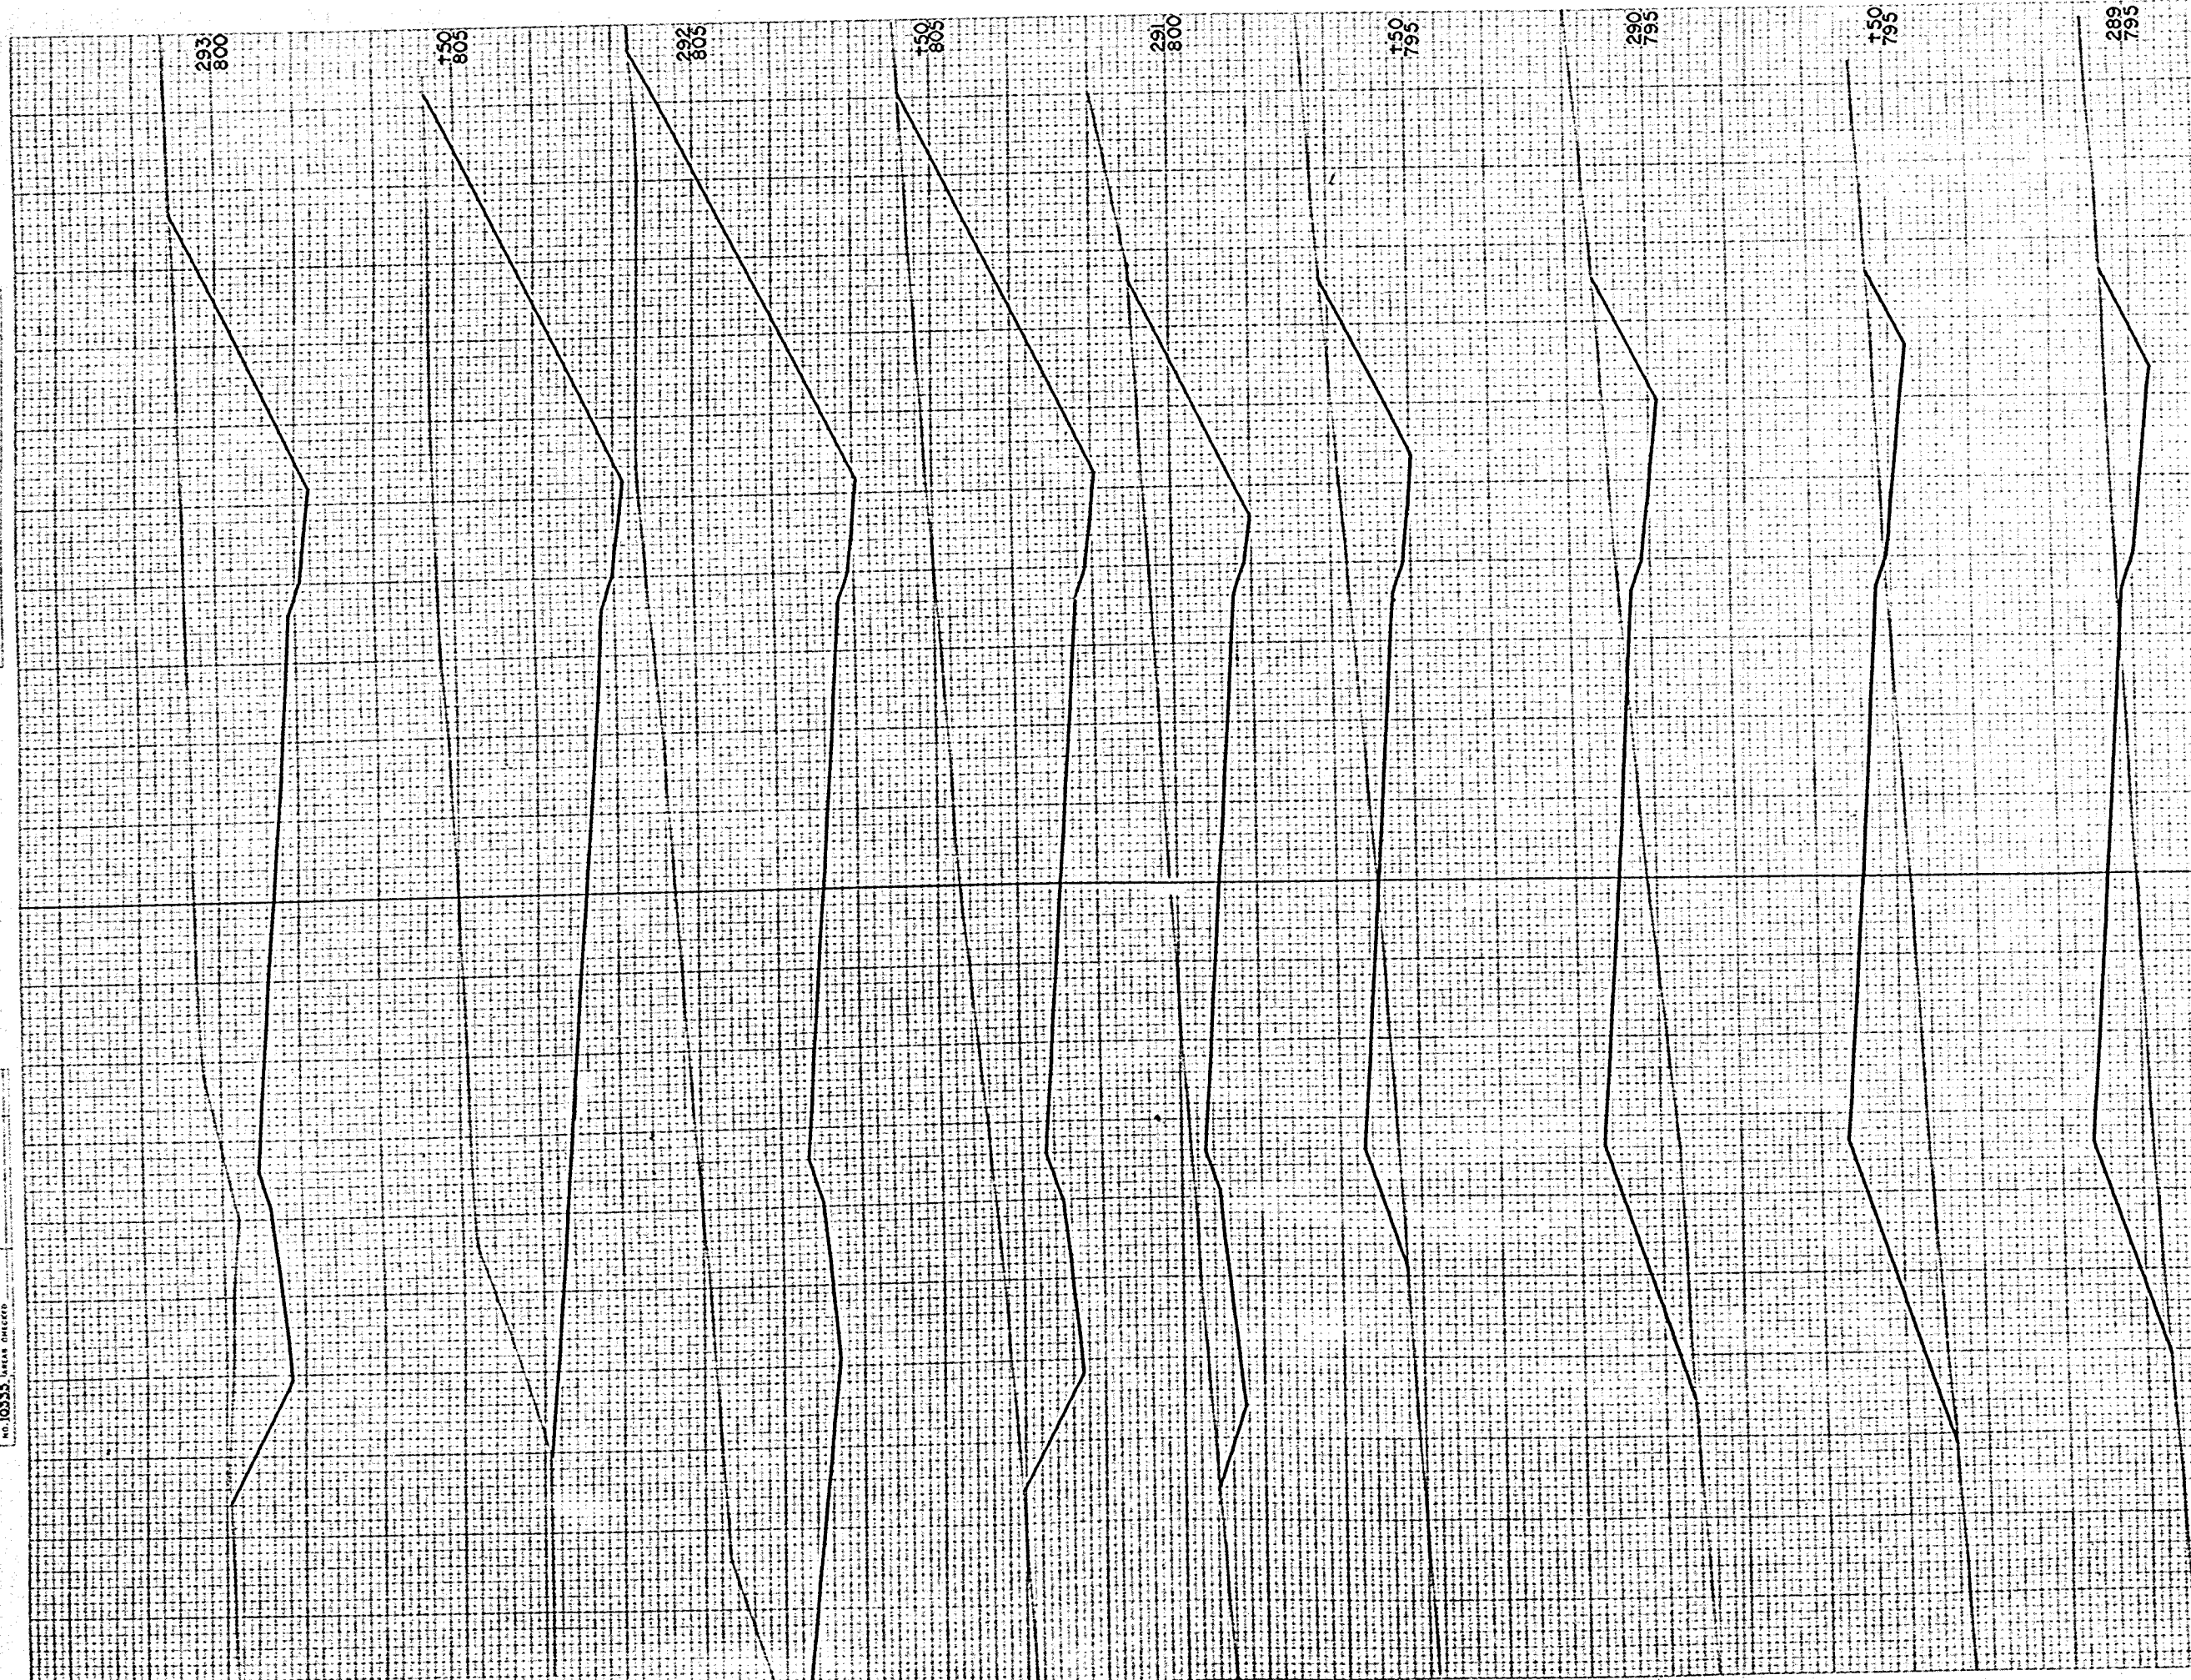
CROSS SECTION D. H. R. & D. E. STANDARD
